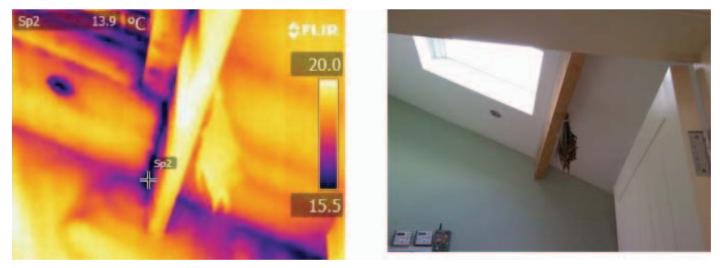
White House Farm, Stirton, Skipton Đingress around roof light casement, beam, wall joint and light fitting in Utility Room.
